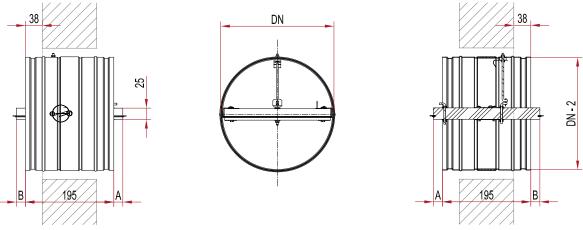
KTM-O-S-...-N damper (with a spring mechanism, nipple connections)
